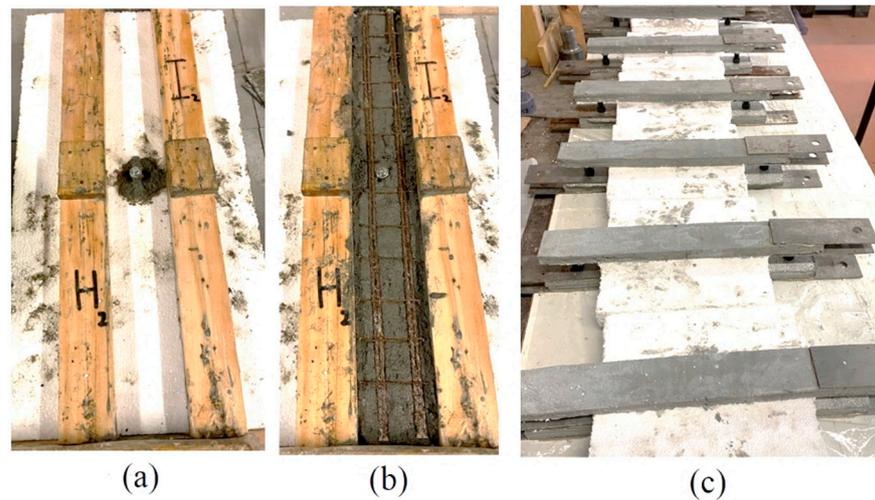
Manufacturing of sandwich panels: (a) mold, (b) fabric with steel connector and first layer of mortar, (c) final specimen.
